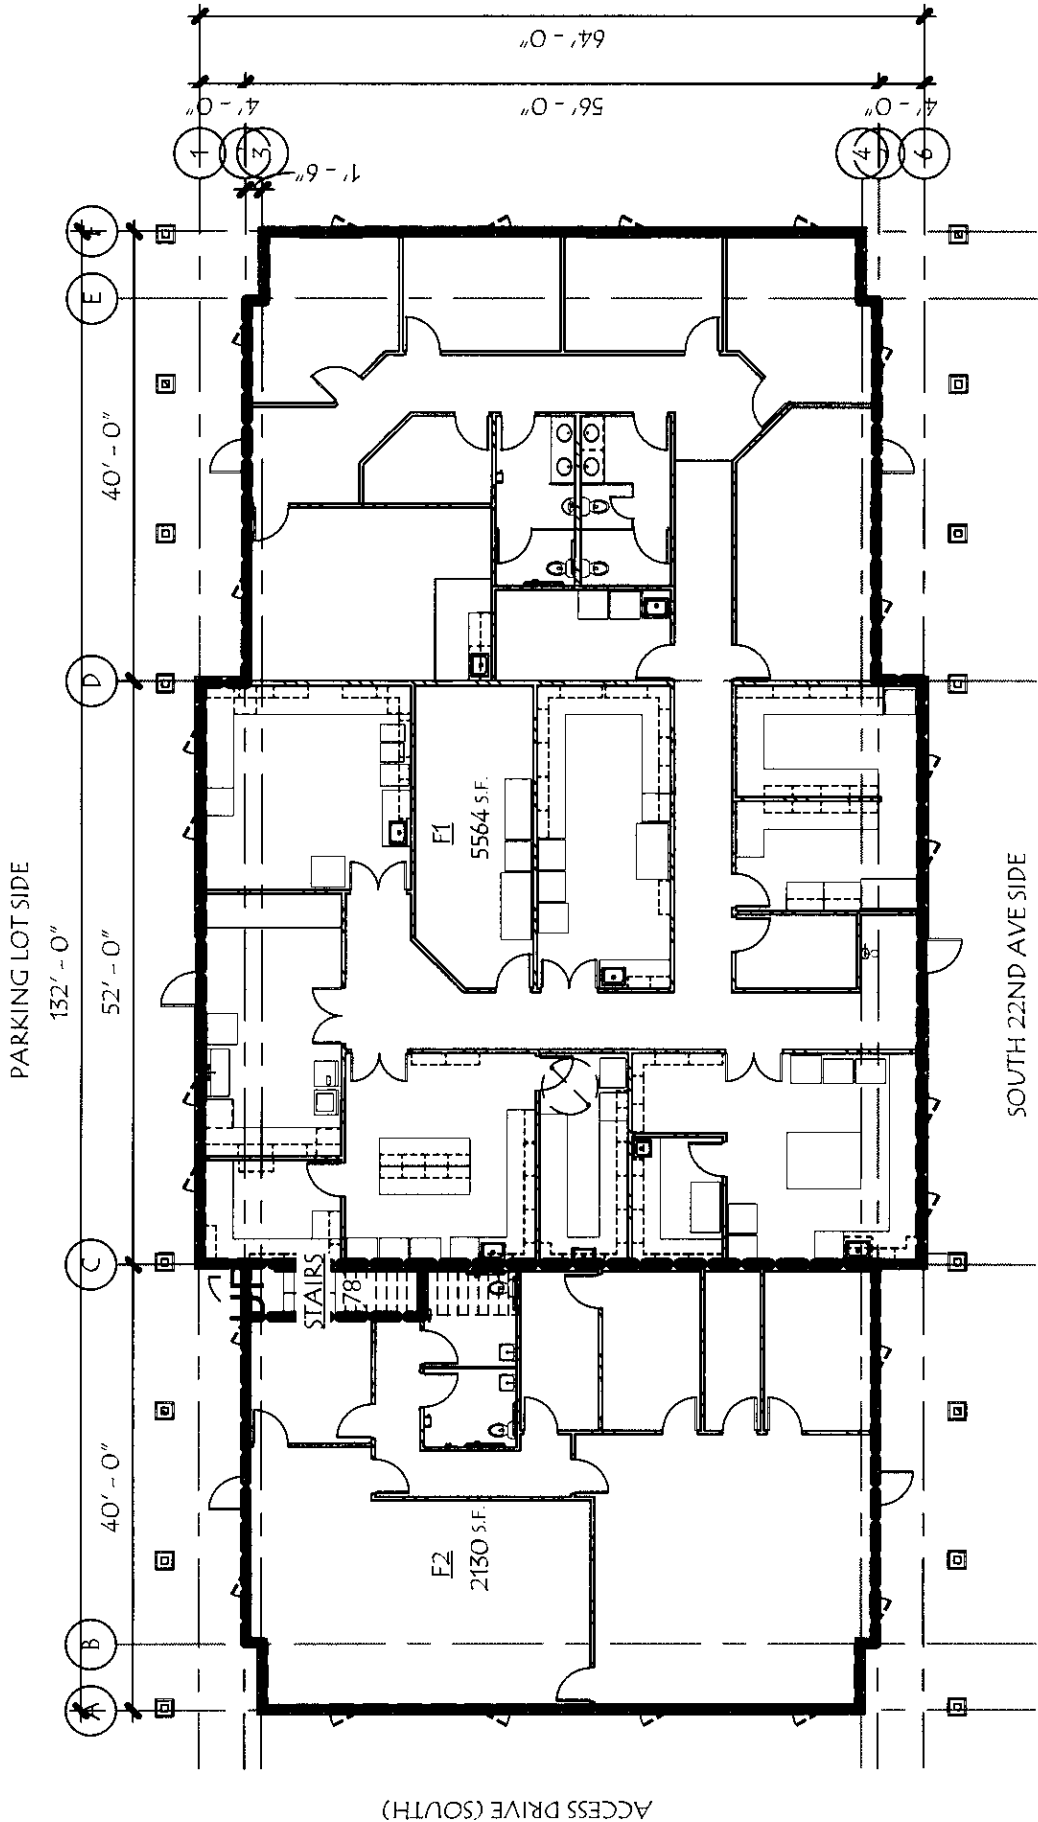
EXHIBIT B - FLOOR PLAN FOR UNITS F1 & F2
